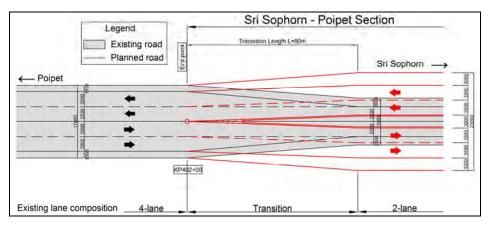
Plan Drawing of the End Point of Sri Sophorn-Poipet Section
